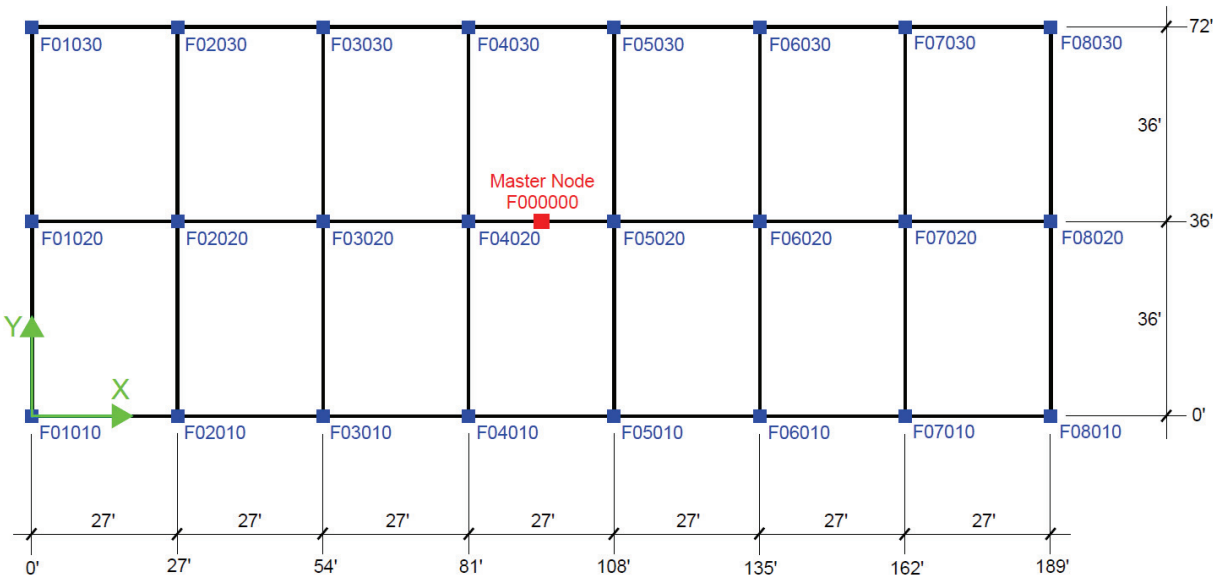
Plan view of the full-building model of the Sherman Oaks building.
